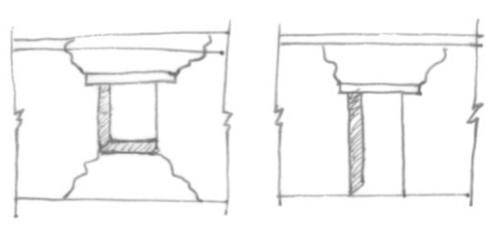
Cracks at openings start at the upper part of the wall and then at the base
